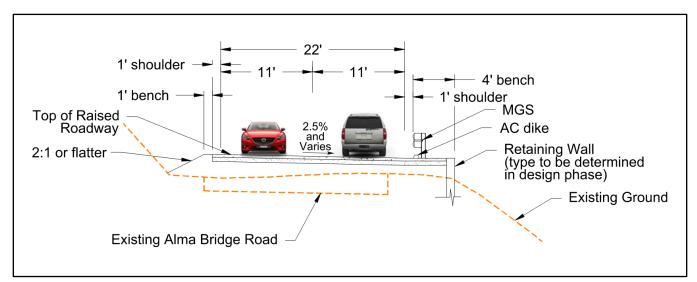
Typical Section #2 – Raised Roadway with Retaining Wall (not to scale)
